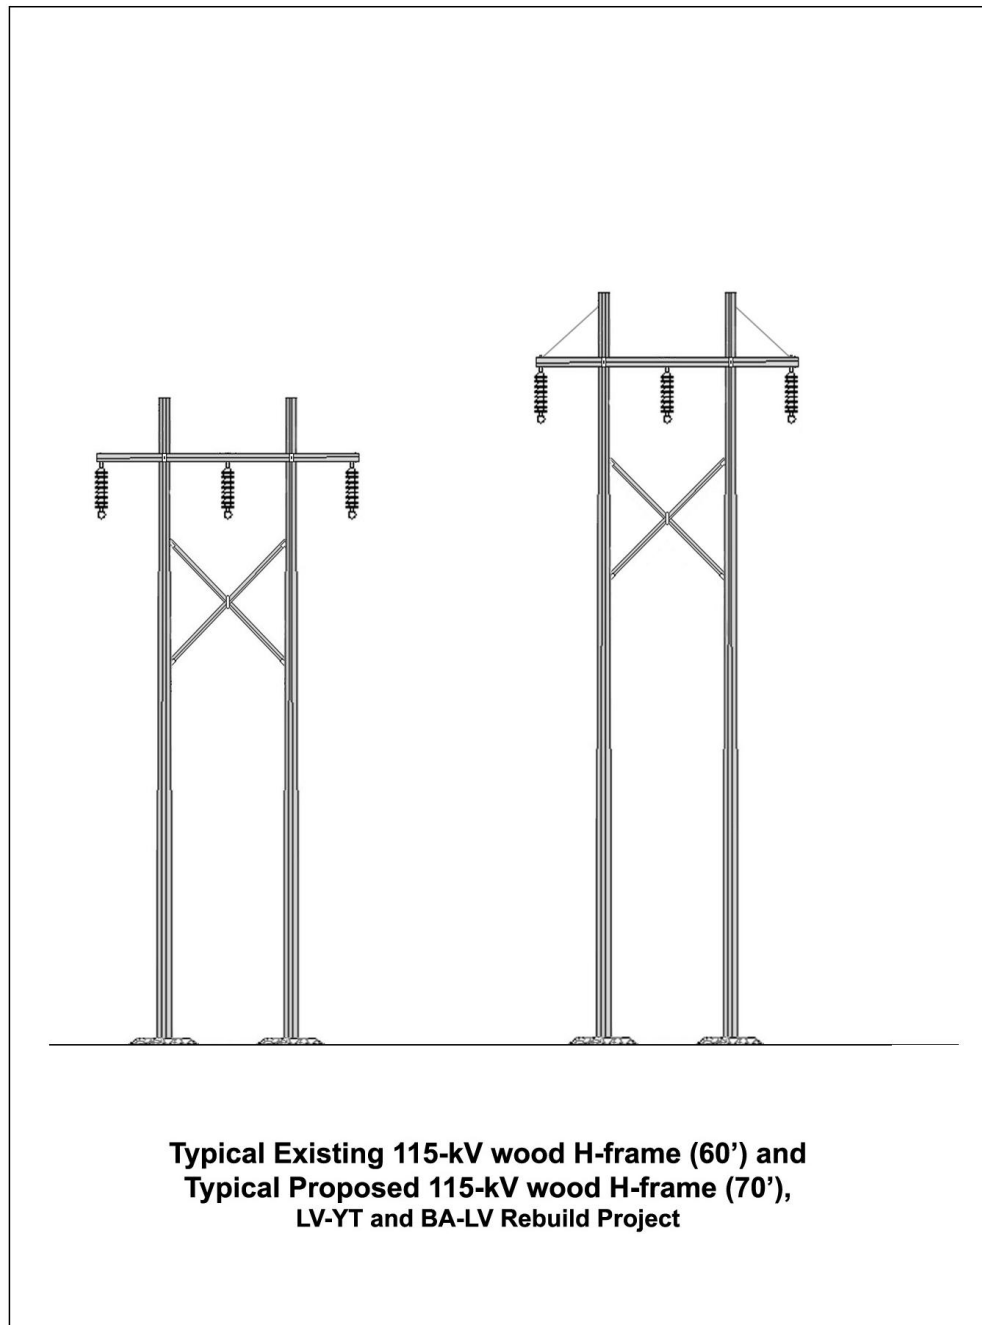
Existing and Proposed 115-kV Wood Pole H-Frame Structures
